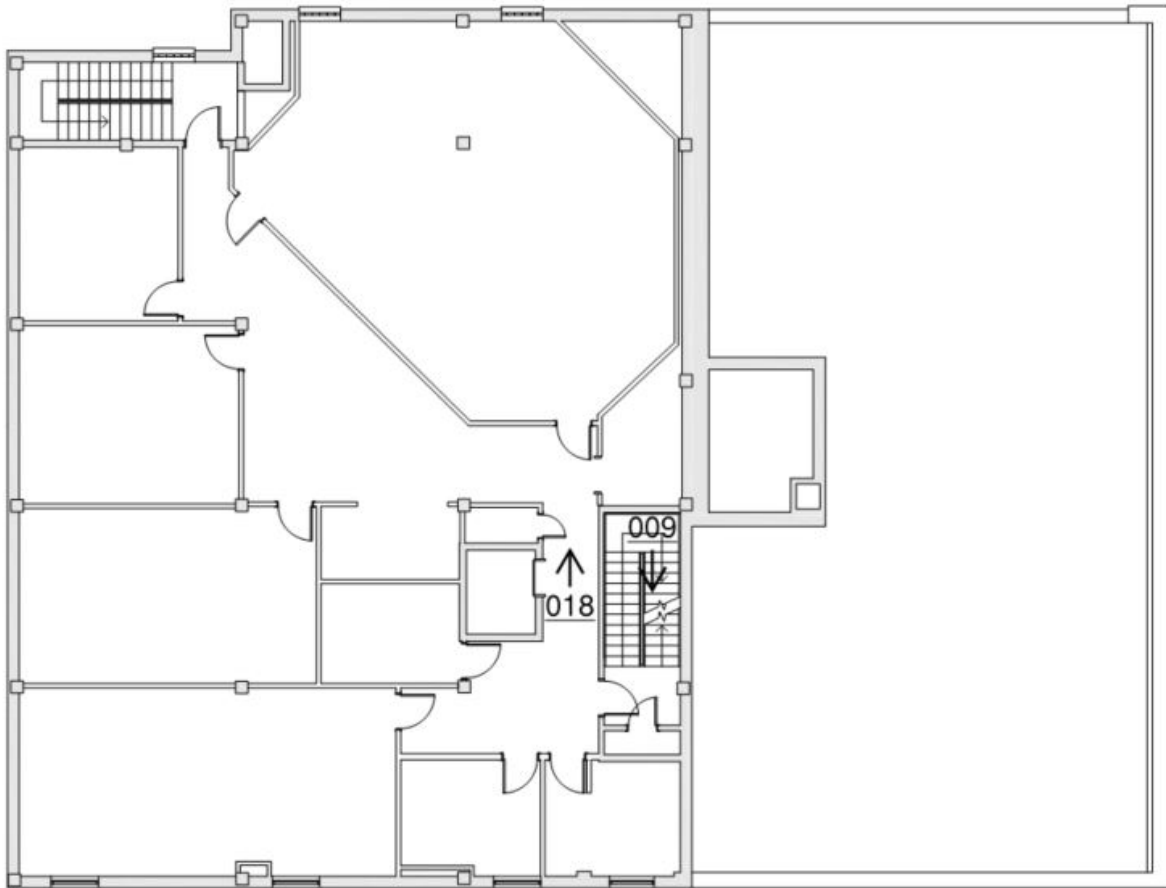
Third Floor Photographic Key Plan. Alley Poyner Macchietto Architecture, Omaha, Nebraska, 2021
